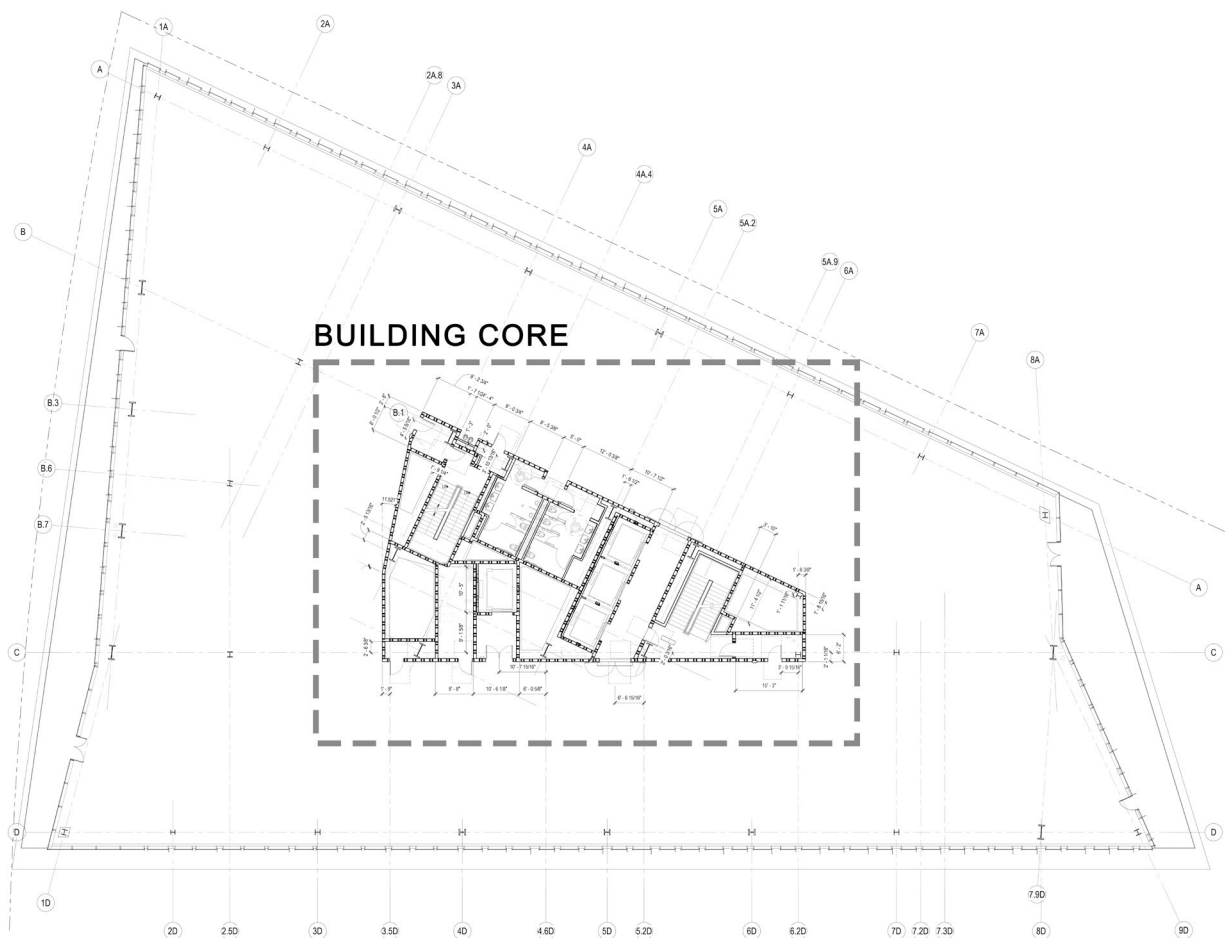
Project O typical plan with level 5 as example (used with permission by Truebeck Construction 2023).
